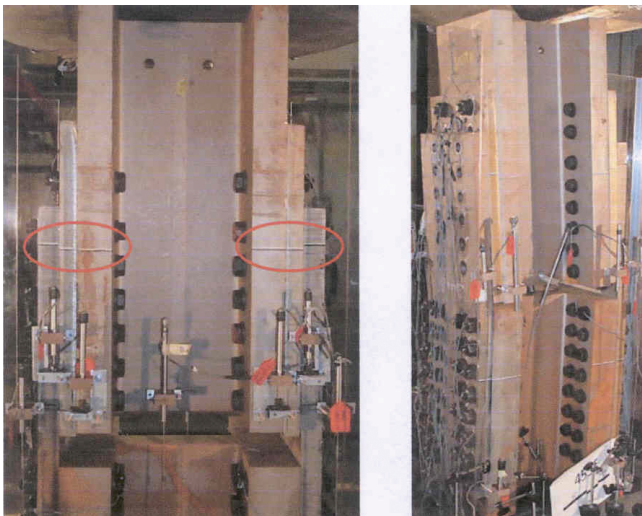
Testing of heavy column splice with filler plates. (Courtesy of Professor J. F. Hajjar)
